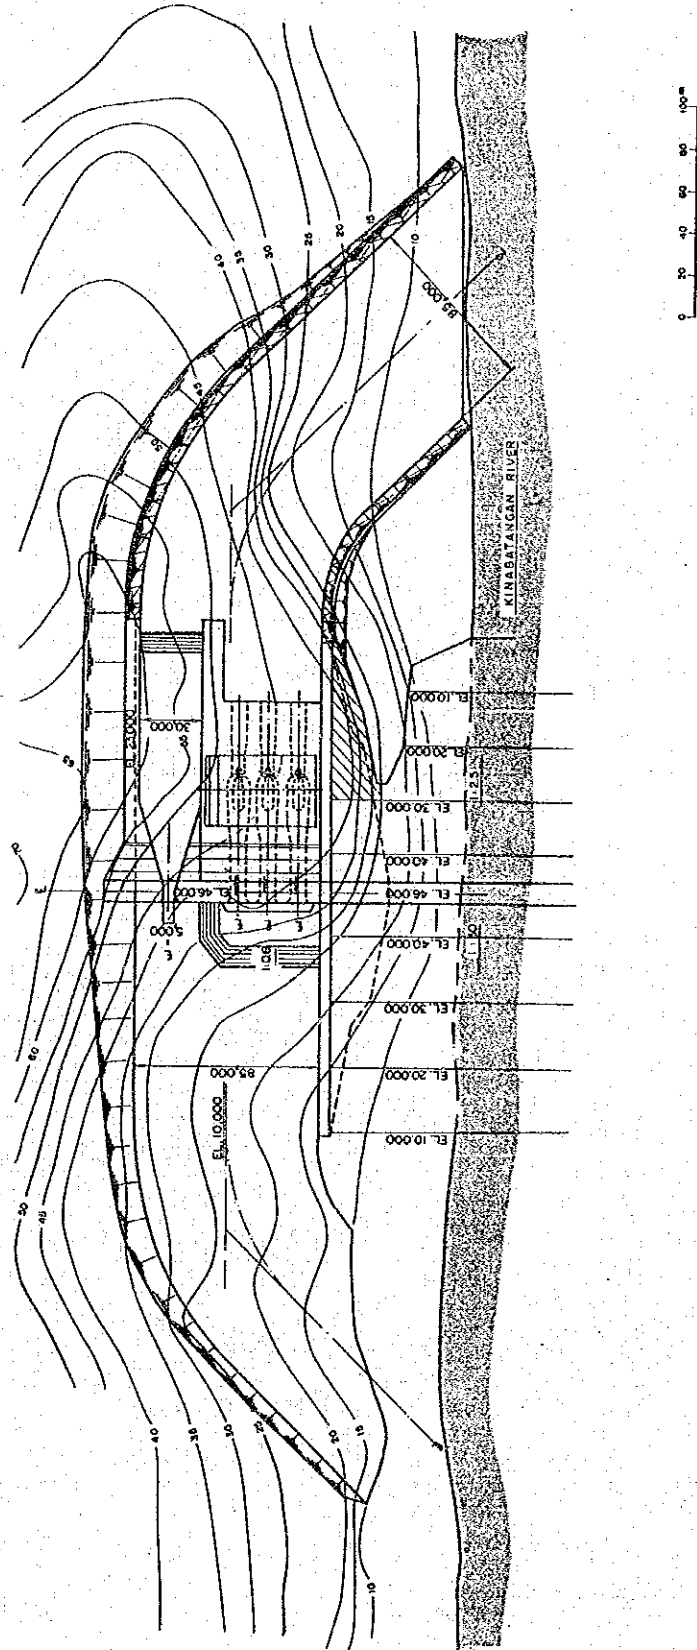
TYPICAL LAYOUT OF FIELD STRUCTURE
